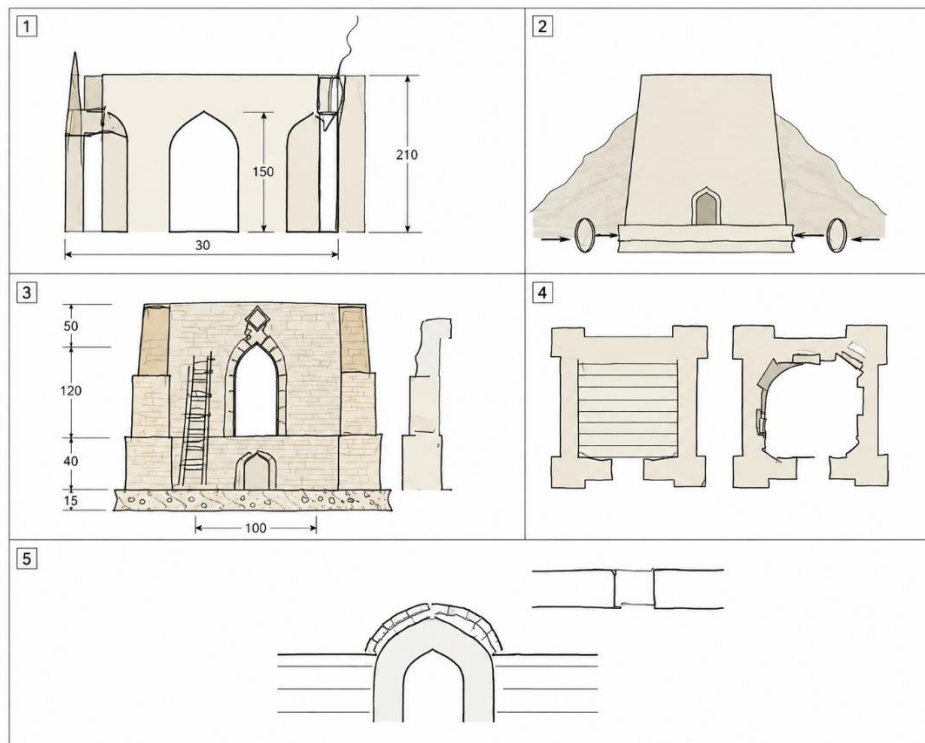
Field sketch of the façade/section and plan of the khumdan, showing arched openings and approximate elevation marks, based on sketches by E. I. Karaev.
